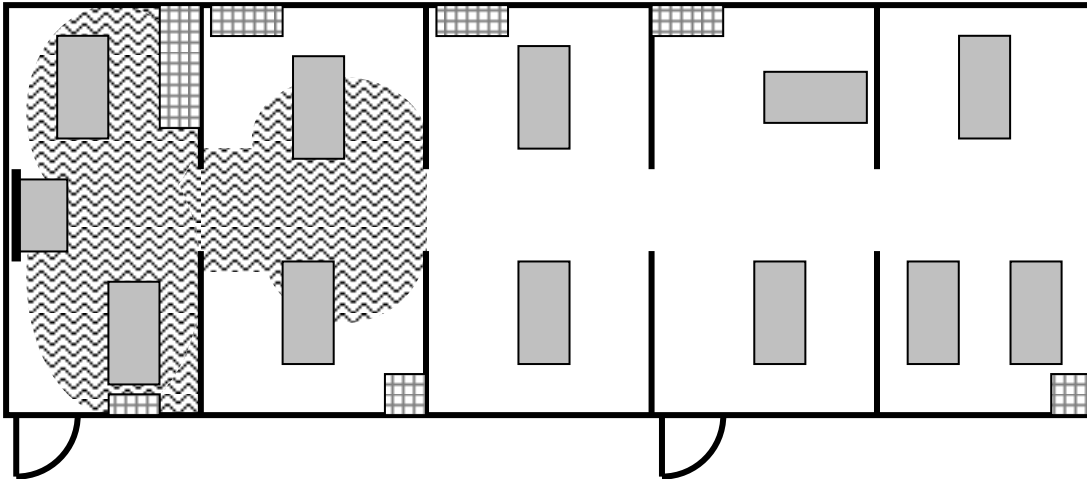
The LCD information display unit placed at the construction site staff break room.
